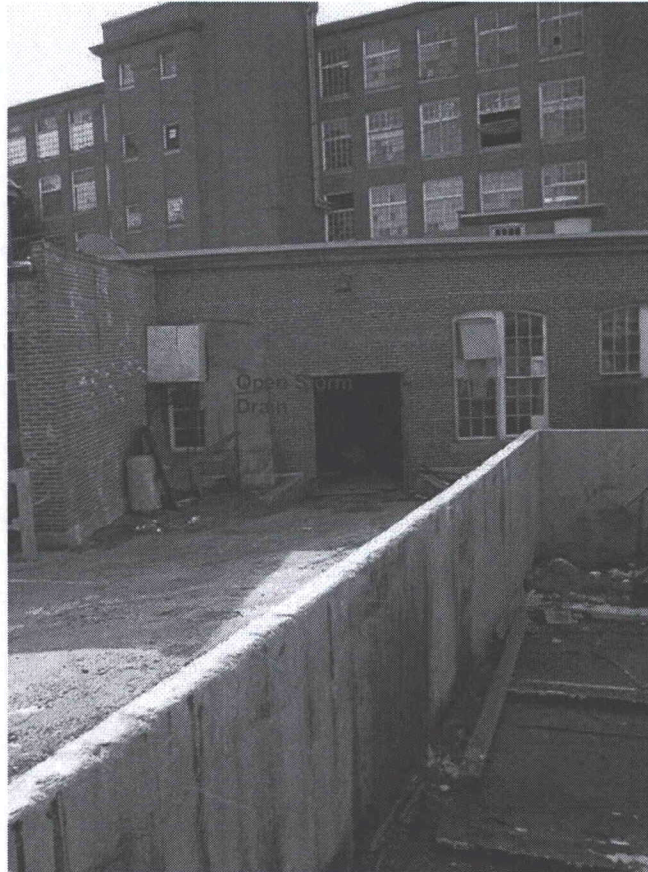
, Retaining Wall Downstream of Boiler Room
